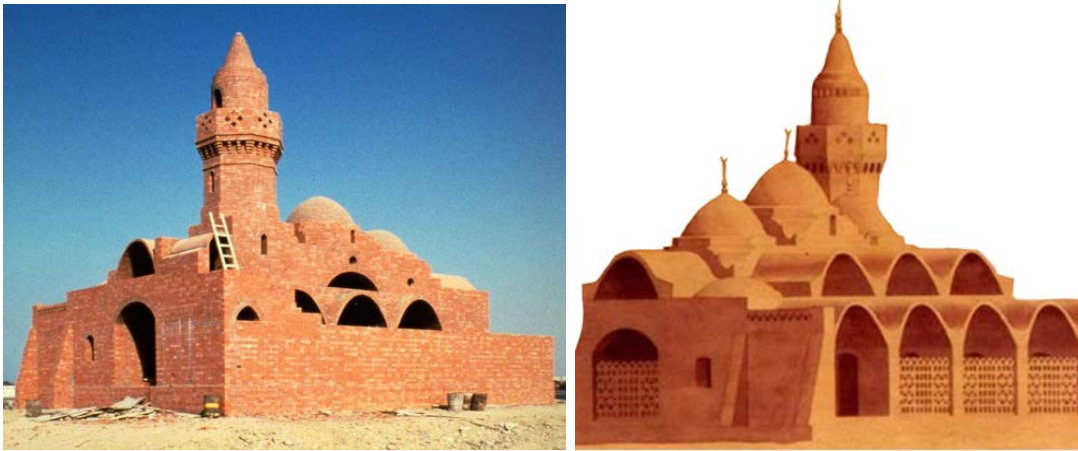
Ruwais Mosque: Main dome and minaret during construction (Khan, 1989a).
